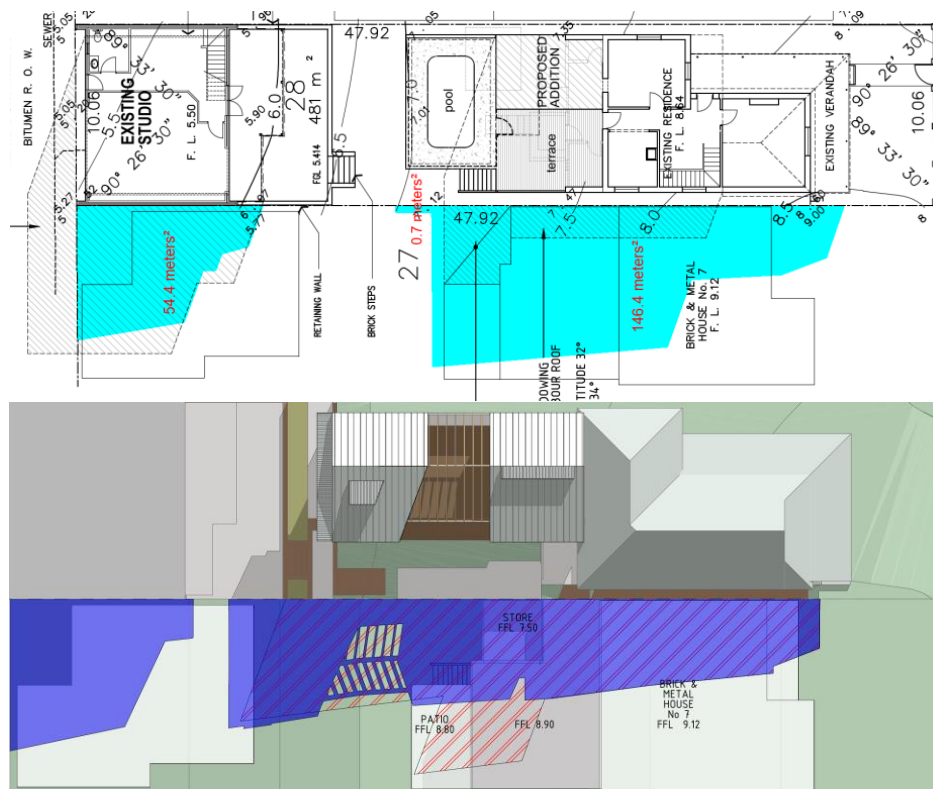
Overshadowing diagrams demonstrating difference in shadow cast by original proposed plans (top), and the current proposed set of plans in blue (bottom).
